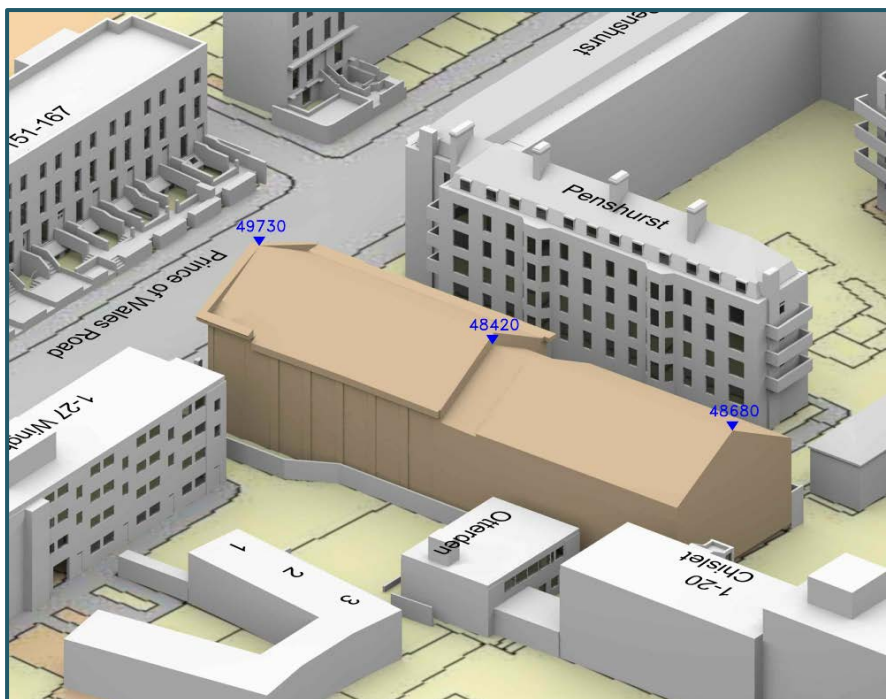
PLAN DEMONSTRATING THE FARSHID MOUSSAVI ARCHITECTURE'S SCHEME
